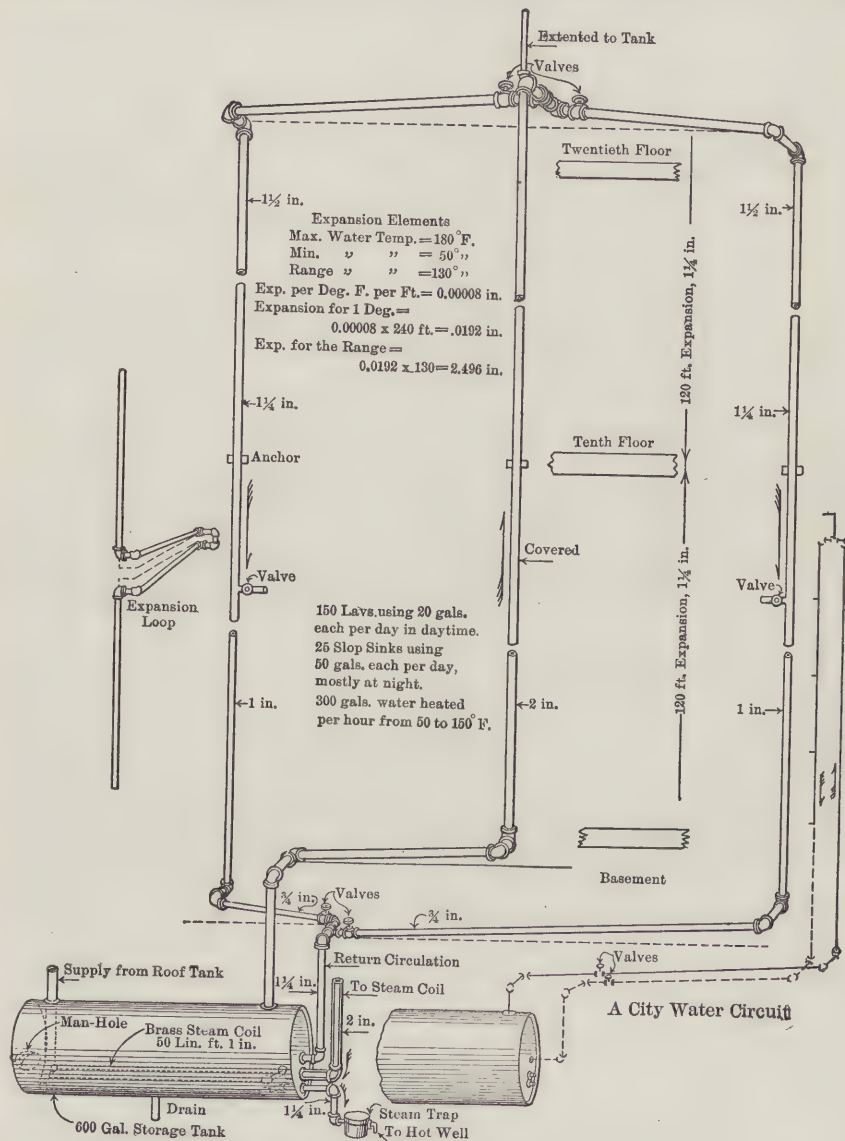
HOT WATER SERVICE FROM ROOF AND STREET SUPPLIES
